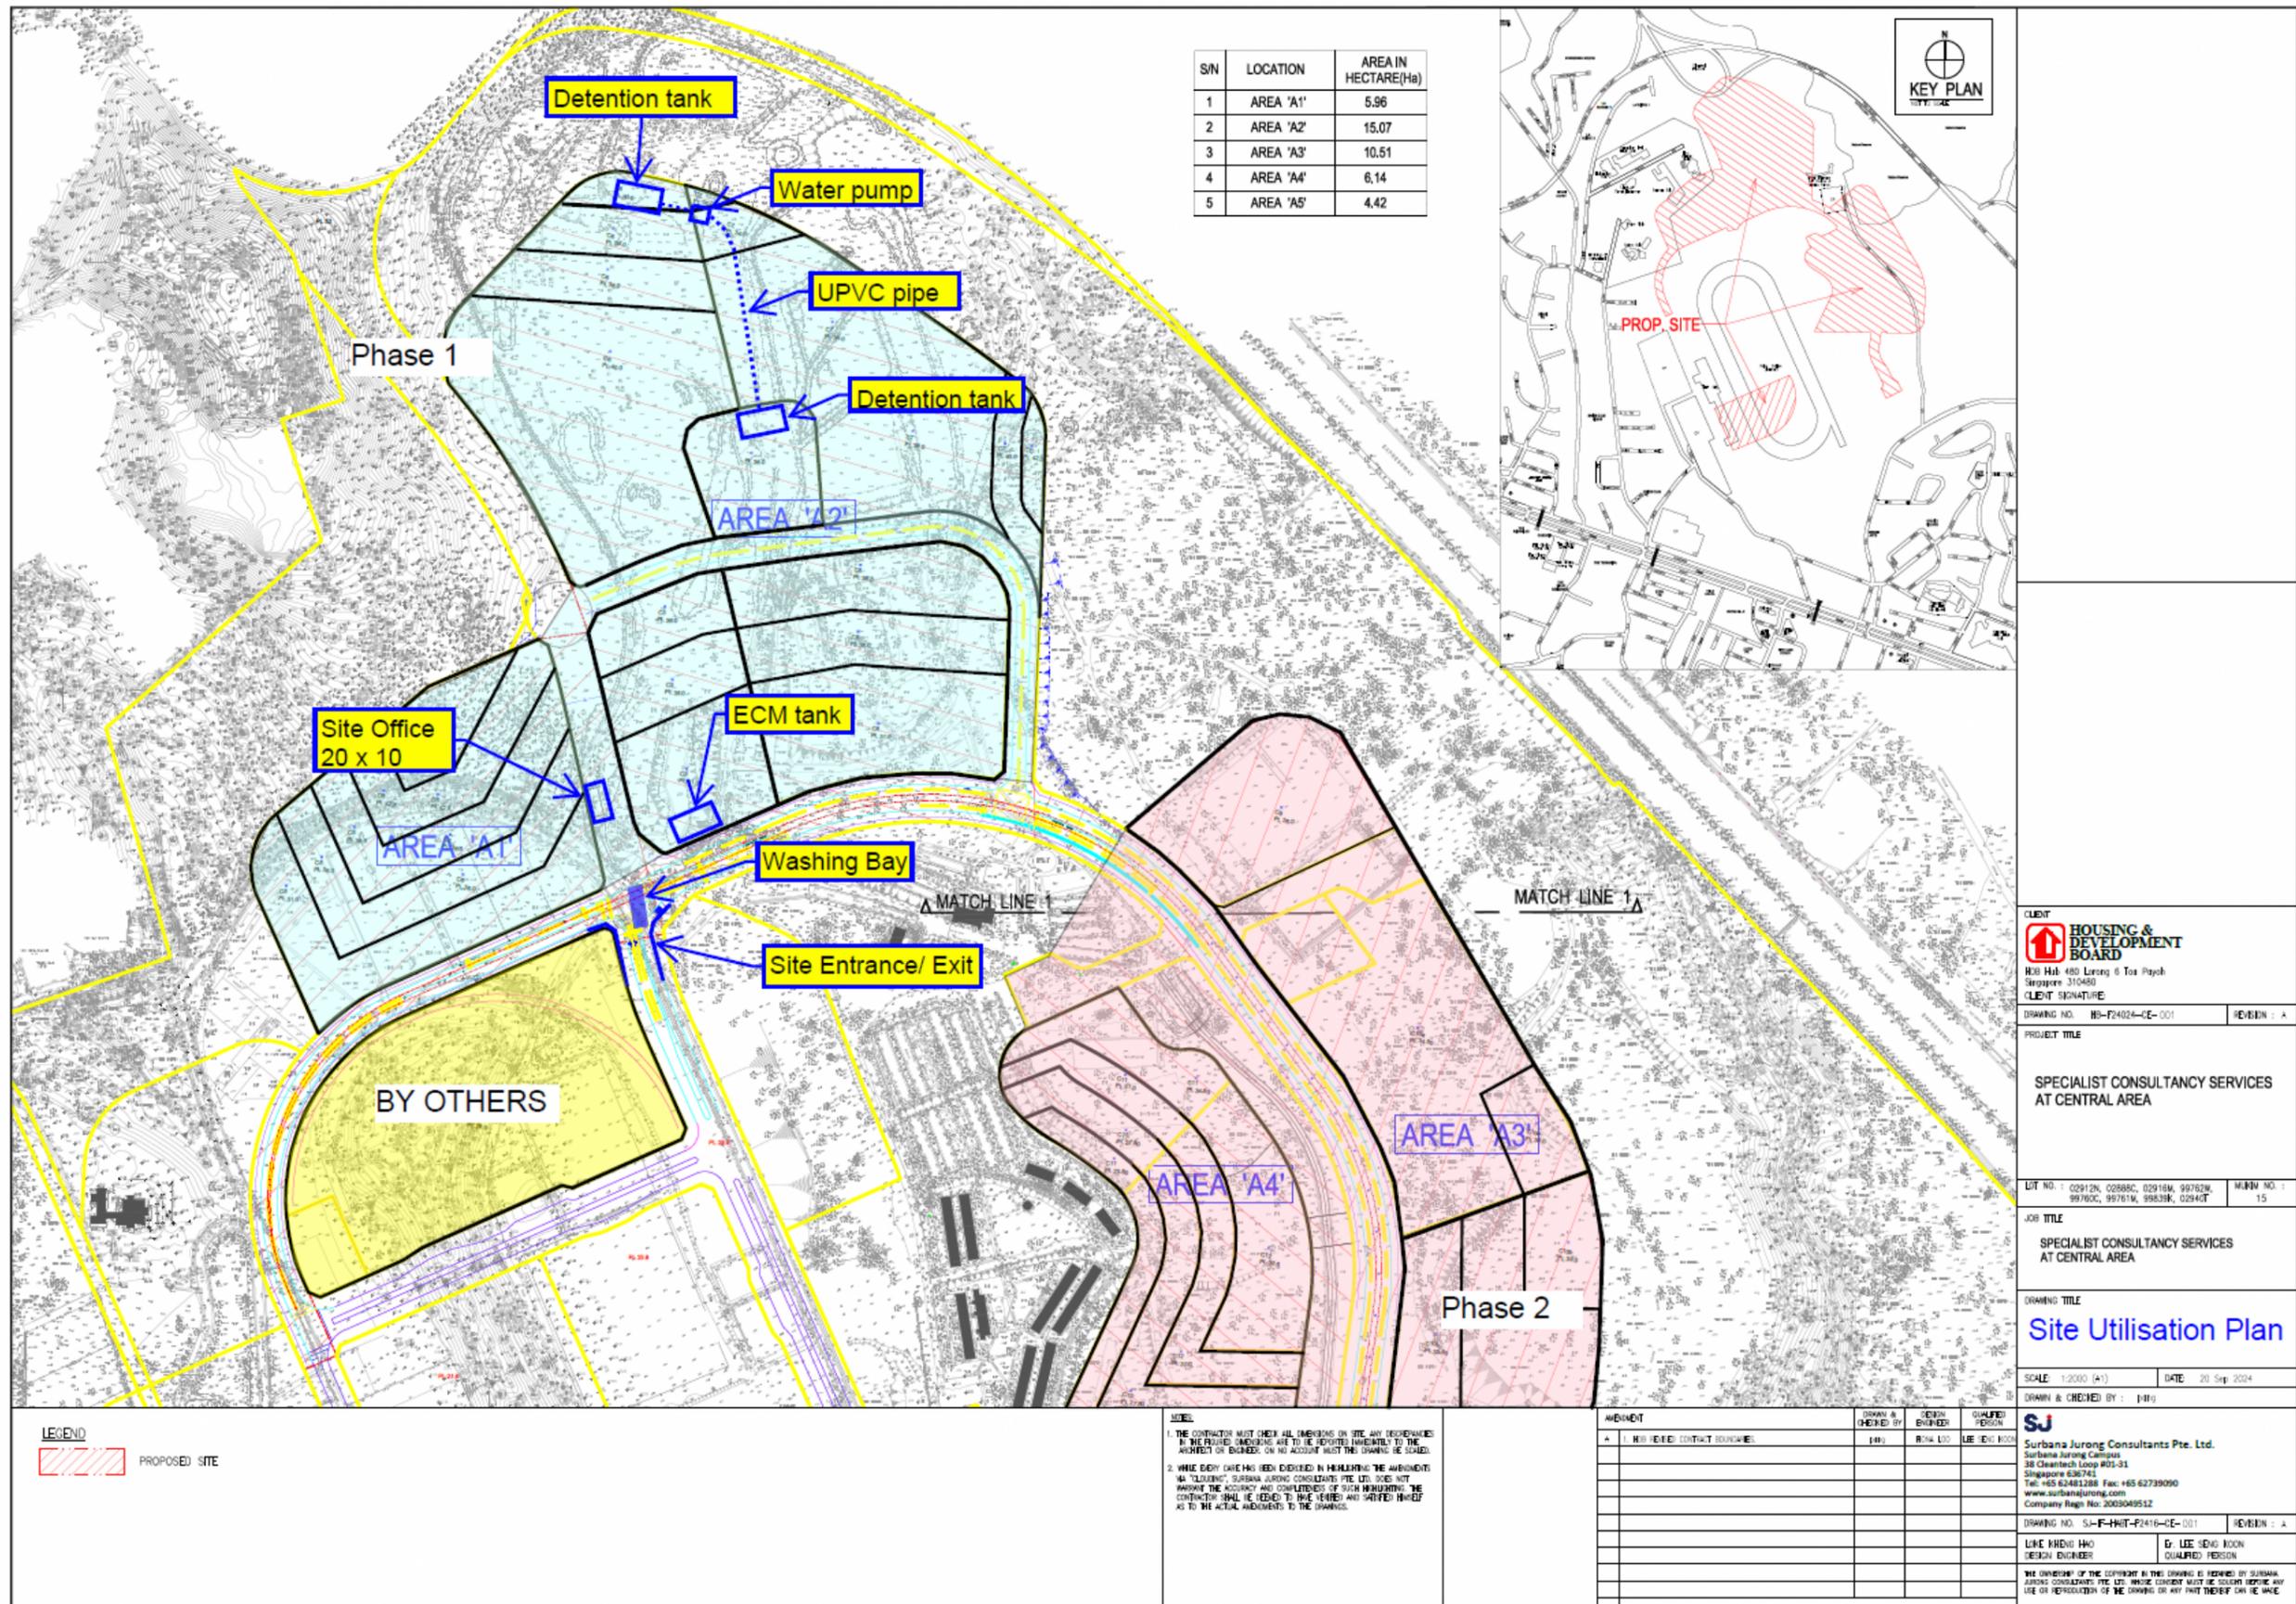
Indicative Site Utilisation Plan for Project (Part 1; Source: HDB-SJ)
